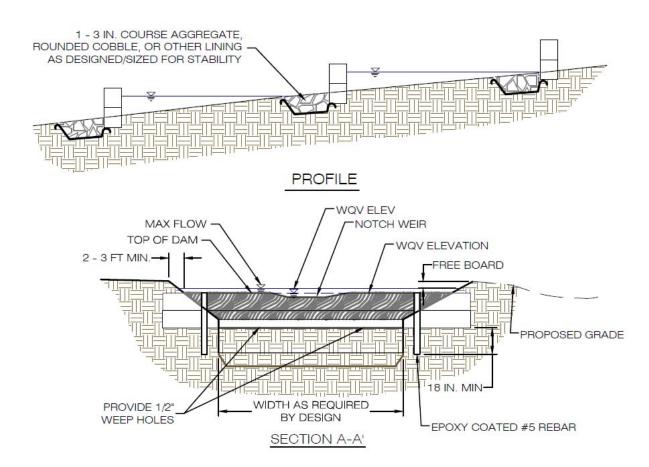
Grass Channel – Typical Plan, Profile and Section
